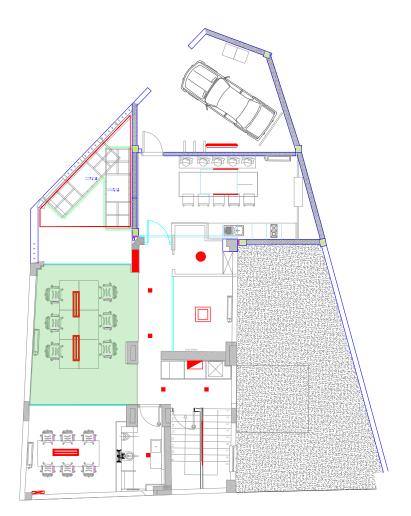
The ERKE Desing Open Office, Basement Layout
